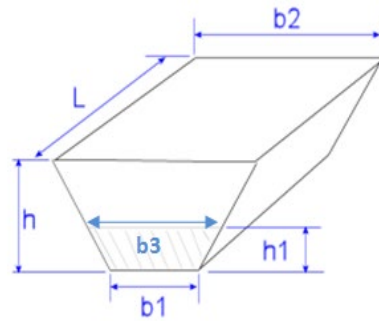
Diagram of trapezoidal prism of gully (h and b2) and trapped sediment (h1 and b3) behind each BMP structure.
